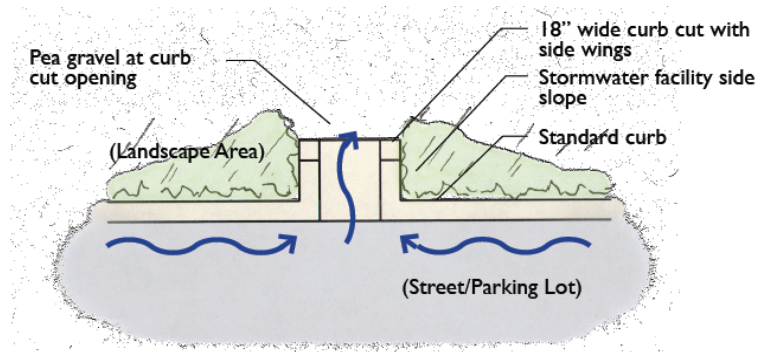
Standard curb cut with side wings: plan view (Source: SMCWPPP 2009)
